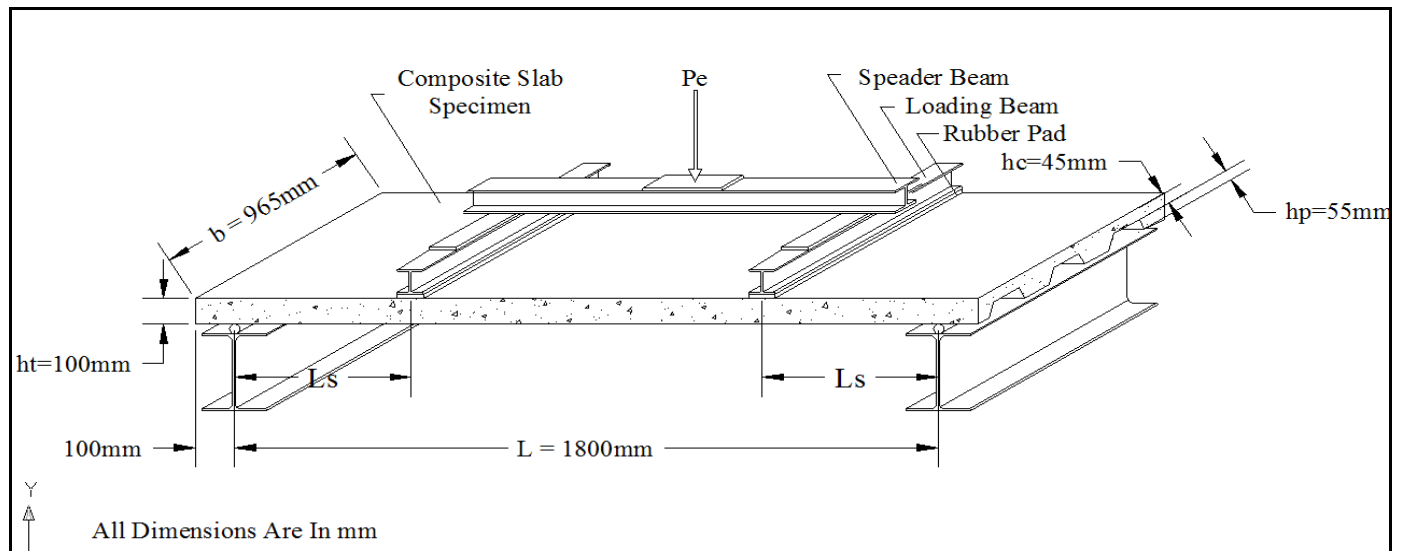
Test set-up for composite slab specimen and R.C.C. slab specimen
